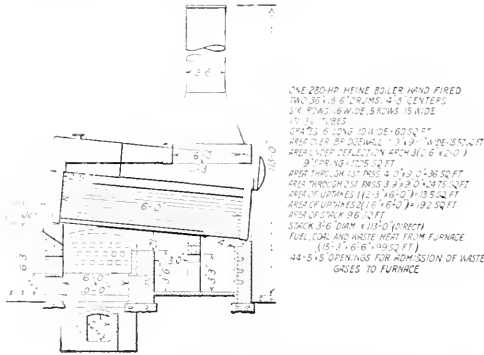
TYPICAL WASTE-HEAT BOILER SETTING WITH AUXILIARY HAND-FIRED FURNACE
